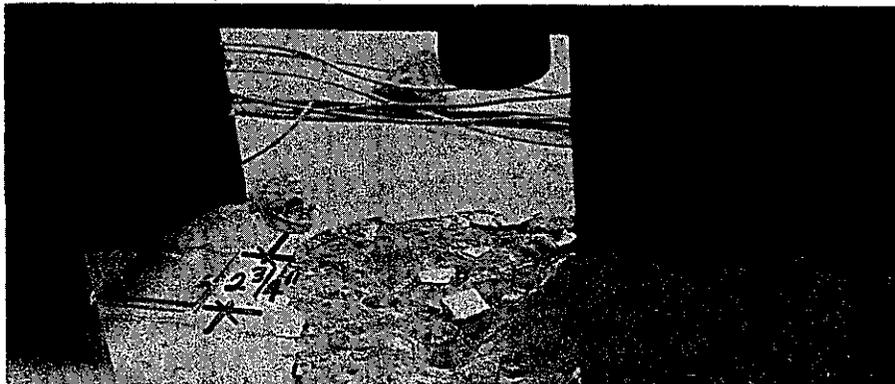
Typical cone failure in concrete slab after an ultimate load test on a resin capsule anchor bonded in a 5-inch-deep hole and installed at a $4 \frac{3}{8}$ -inch edge distance.
